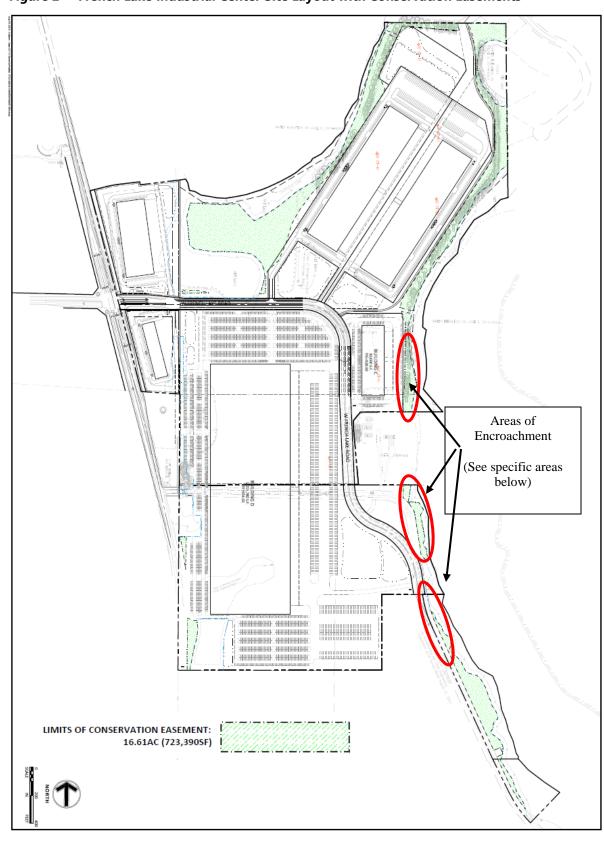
French Lake Industrial Center Site Layout with Conservation Easements
